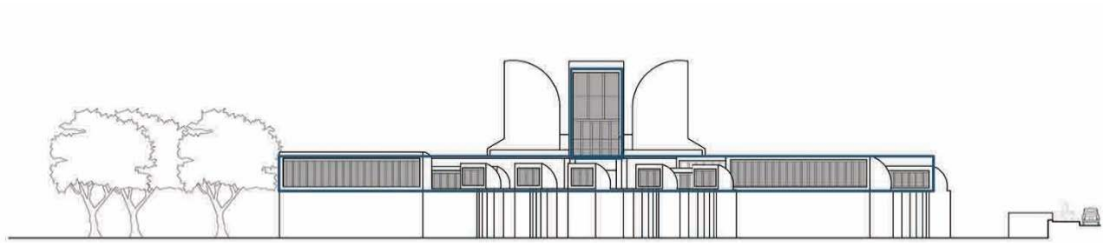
Openings of TMOCA building. Drawing by the Author (2020).
